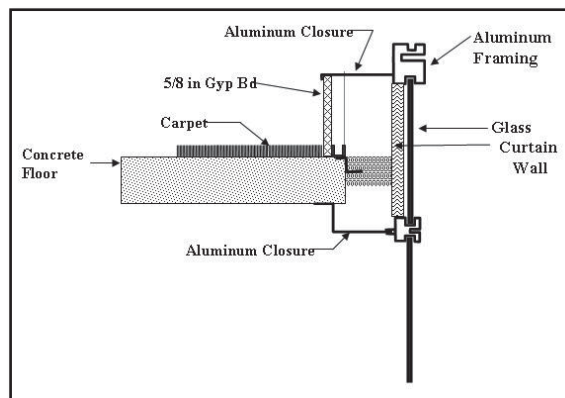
Vertical Section: Junction of Exterior Wall and Floor
